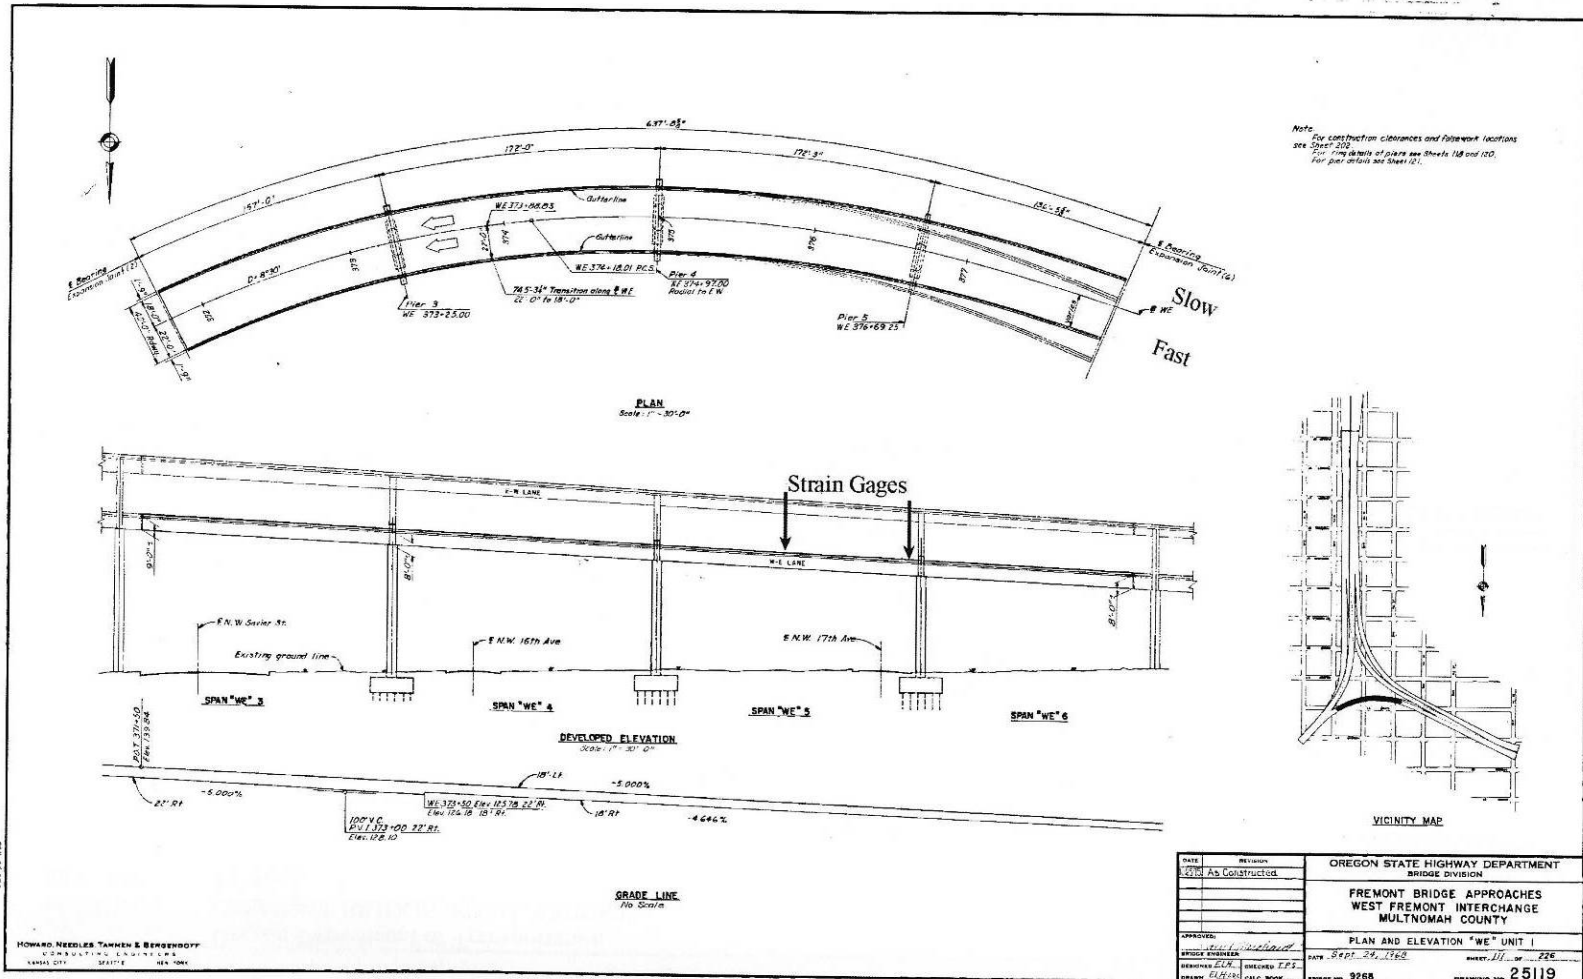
Instrumented sections for Bridge superstructure 09268E (WE line).
